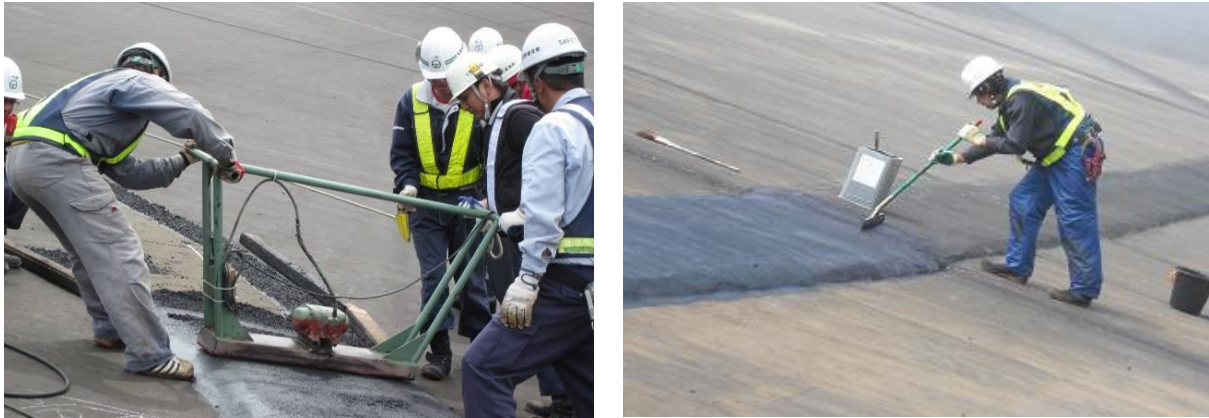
Typical Section of Repair works for Cracks on the Asphaltic facing
